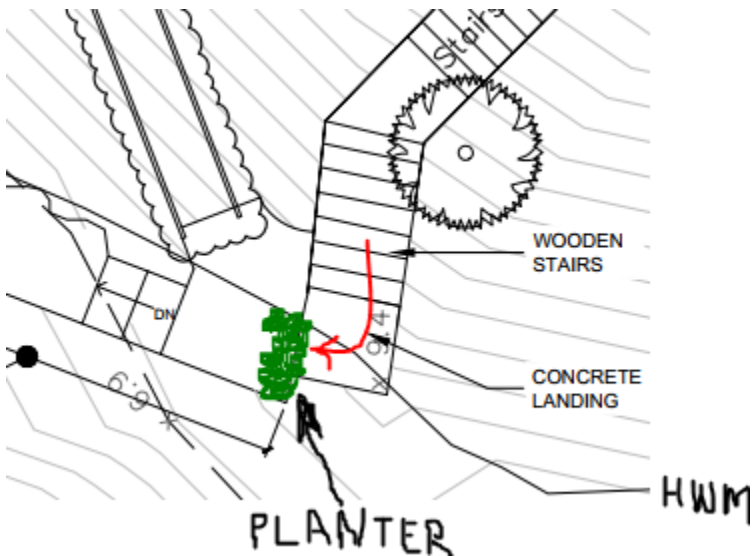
Potential for Obstruction of Egress off of 51’s Beach Access Stair Landing with Planter
